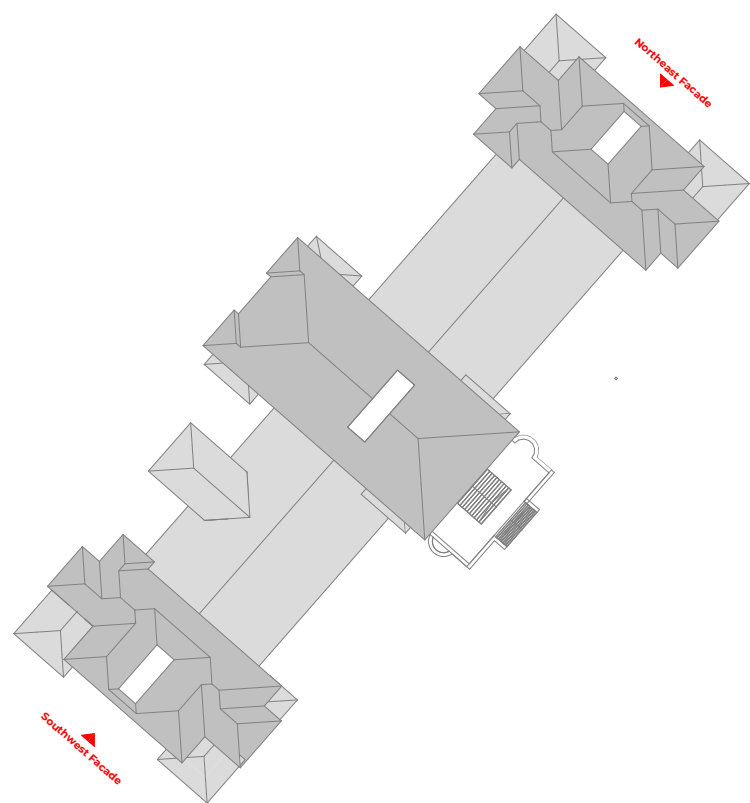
Roof Plan (Source: Created by the author, 2024)
